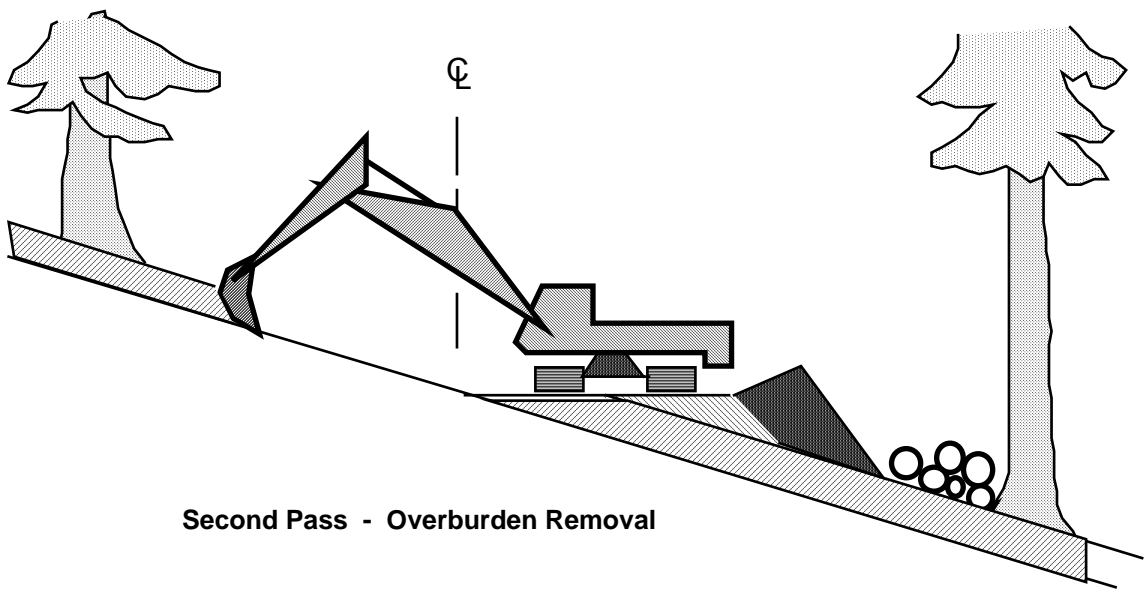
Second pass with excavator, removing or stripping overburden or unsuitable material and placing it below pioneer road.
